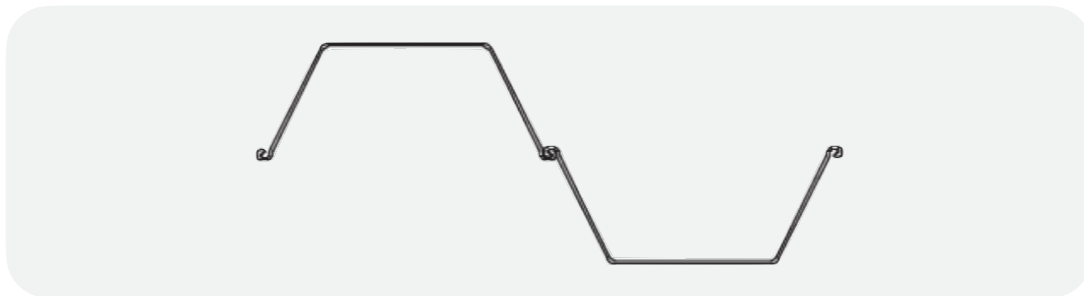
Typical cross section of a steel sheet pile (Steel Piling Group, 2020)
